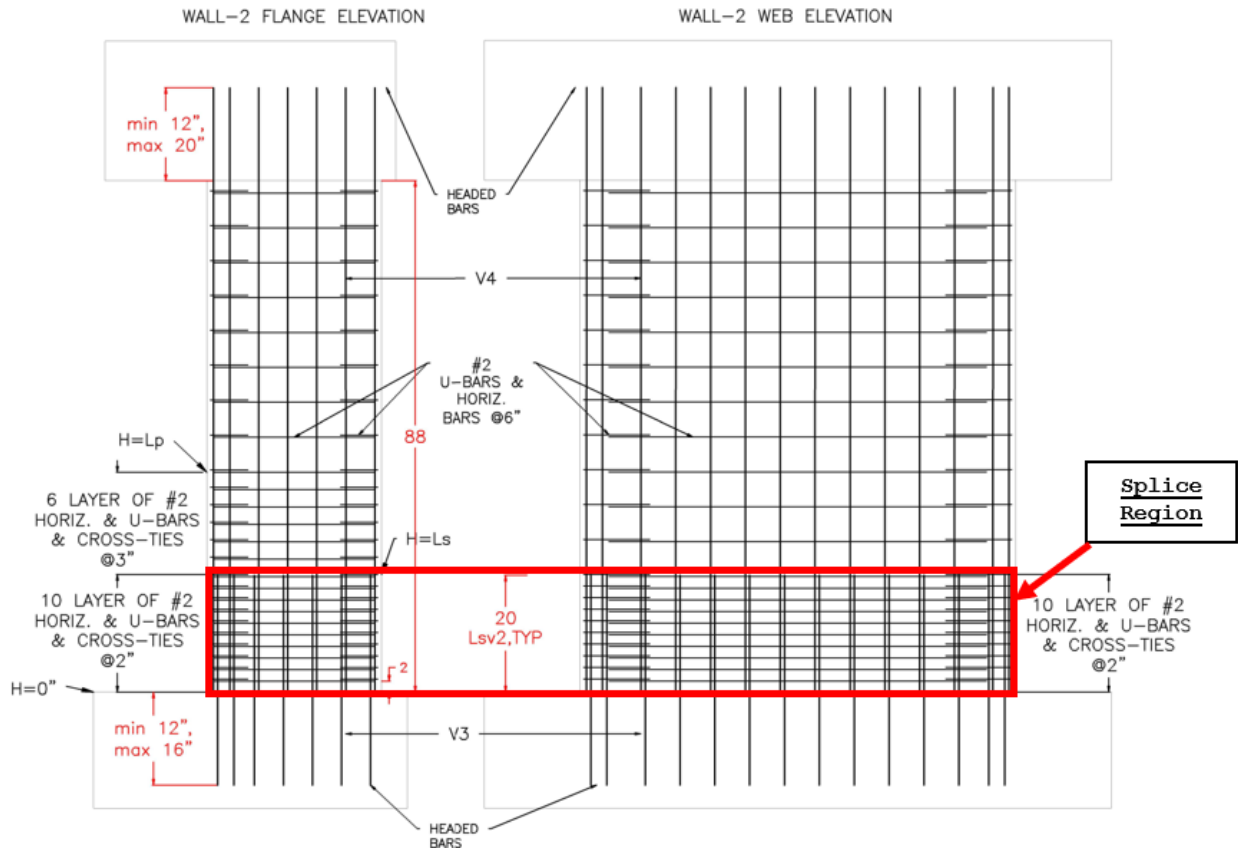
Ordinary wall elevation view (Unal et al., 2024)
